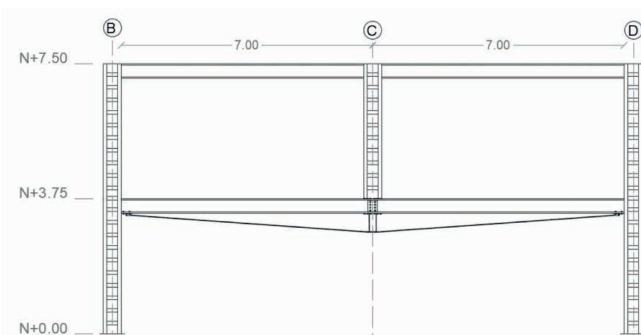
Sectional view of the post-tensioning reinforcement in the frame.
